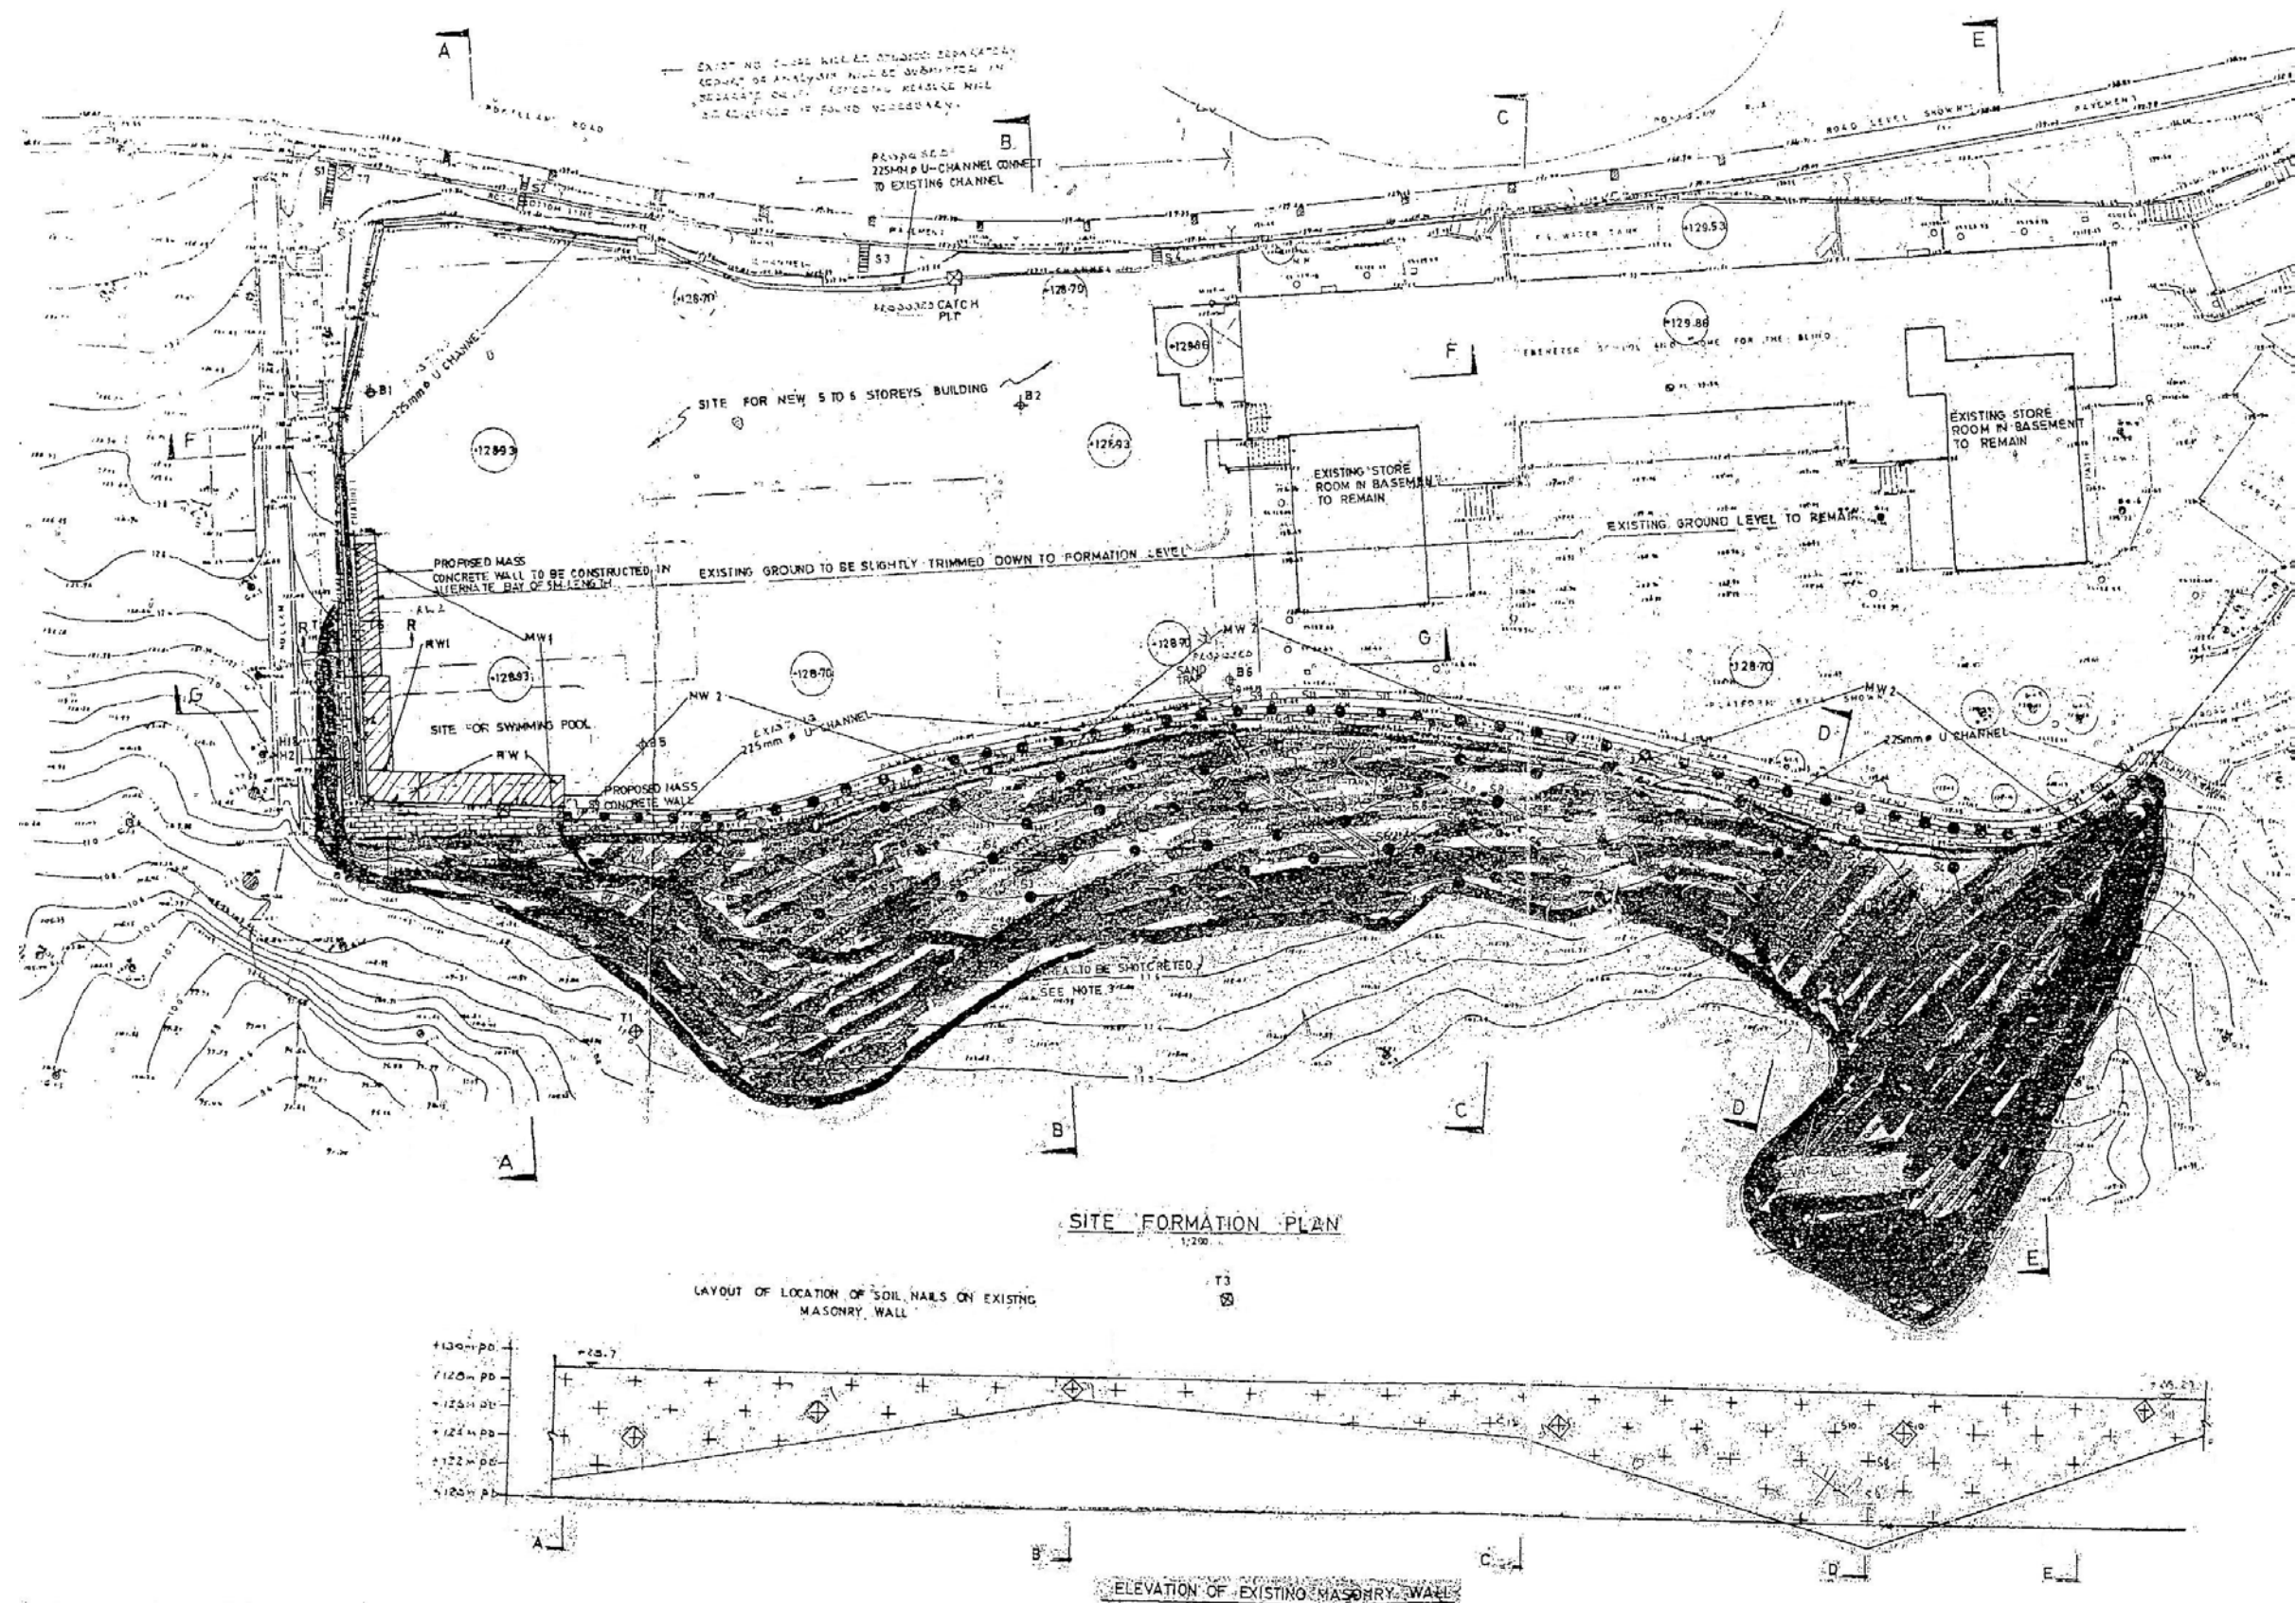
Proposed Soil Nail Arrangement (Extracted from BD Approved Plan No. SF02 dated 24 March 1993)
